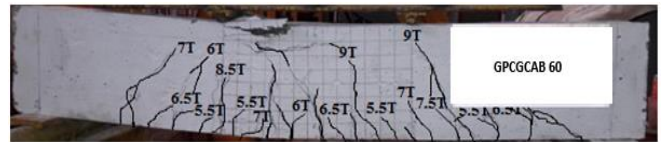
Figure XVII Crack Patterns of M 60 GPCGCA Beam
